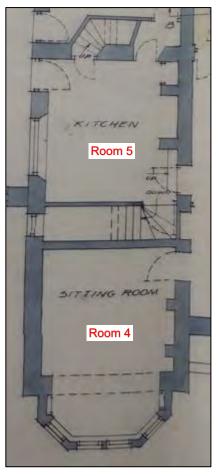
Extract from the 1929 plan showing former configuration of Rooms 4 and 5 (BARS ref: RDB P 1/1314)
